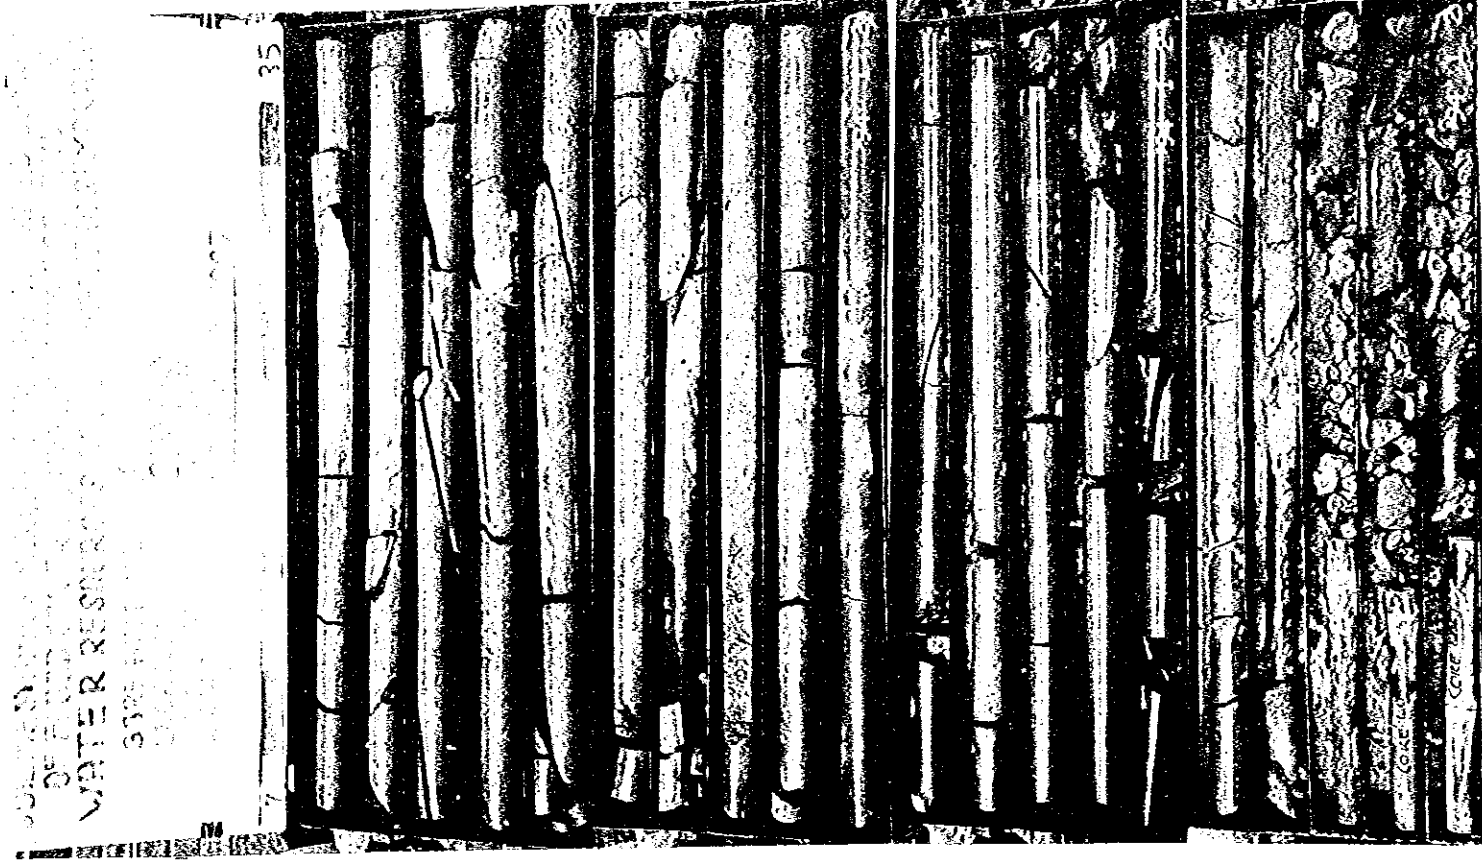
Drilling Core Photograph of Bore Hole No. A - 4 (2 of 2)
